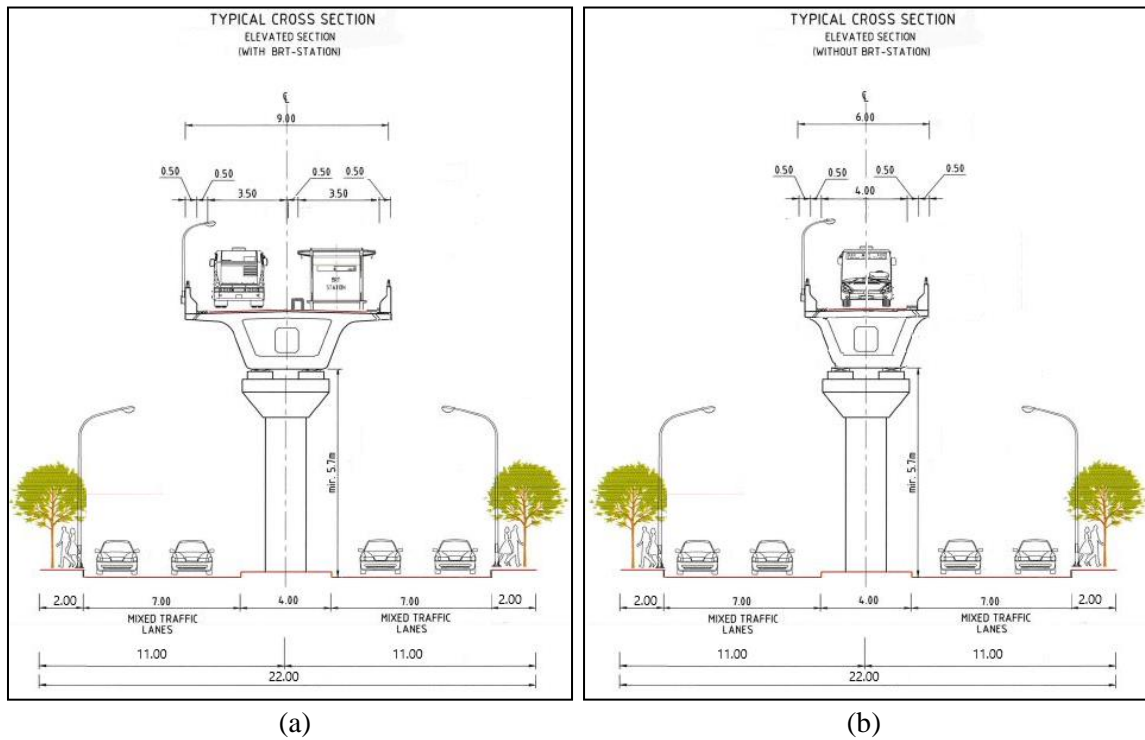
Proposed BRT Cross Section of Roadway (Single lane flyover) to be implemented (a) with station, (b) without station
